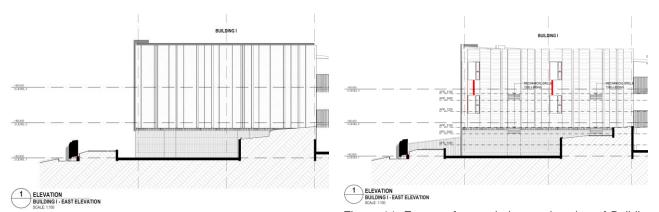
Extract of previously proposed east elevation Building I (Source: Fulton Trotter)
